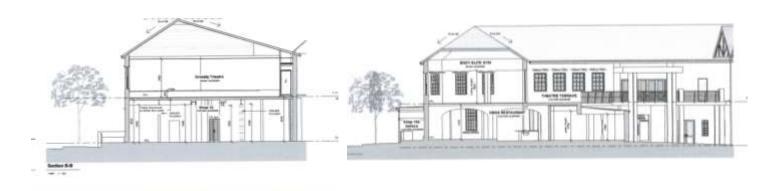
As Built Cross Sections north-south (left) and east-west (right) (DHK Architects).
